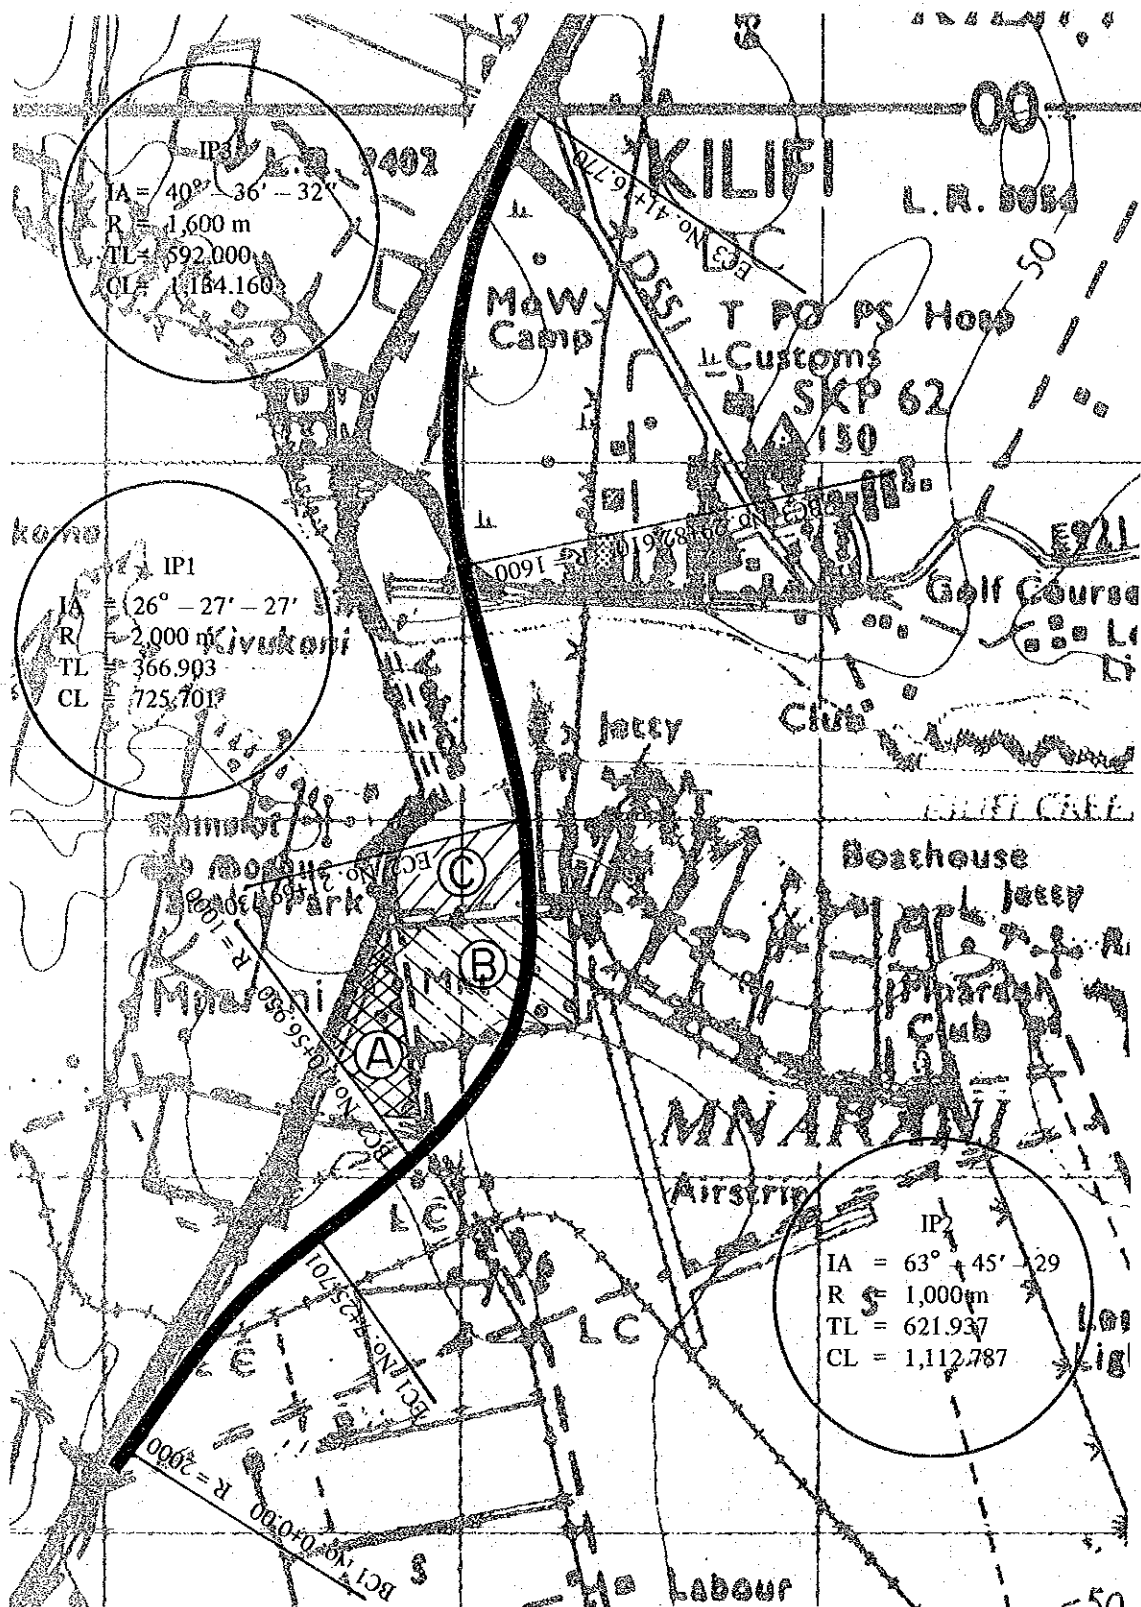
HORIZONTAL ALIGNMENT PLAN
